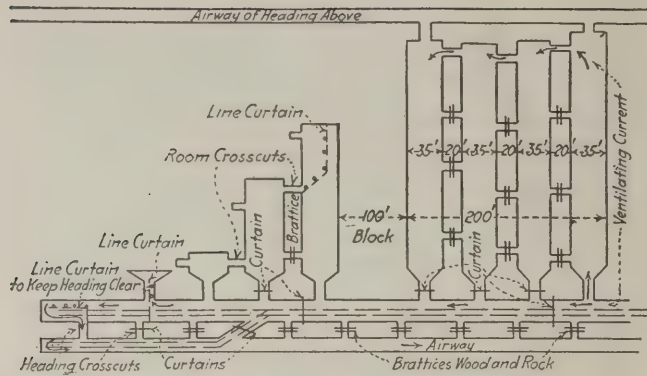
Plan of Entry and Rooms in Pitching Bed
